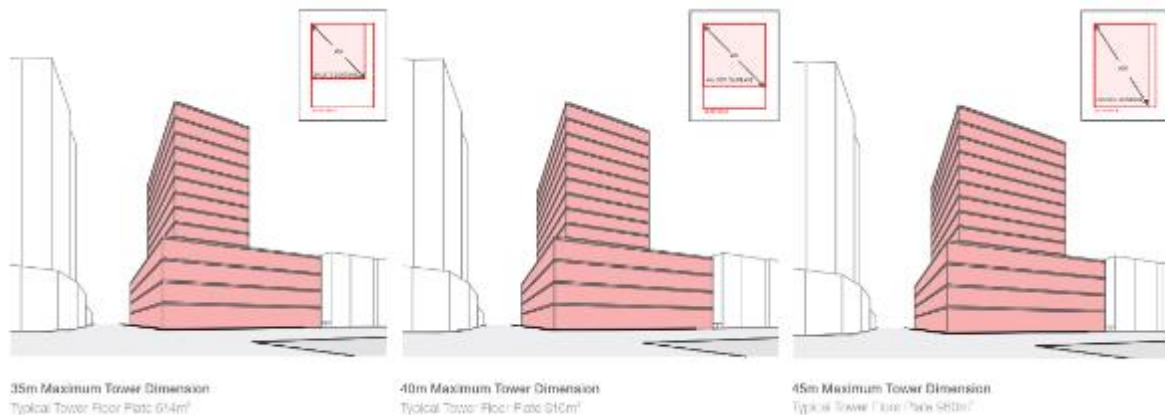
Modelling of Tower dimensions (Architectus)²⁷.
